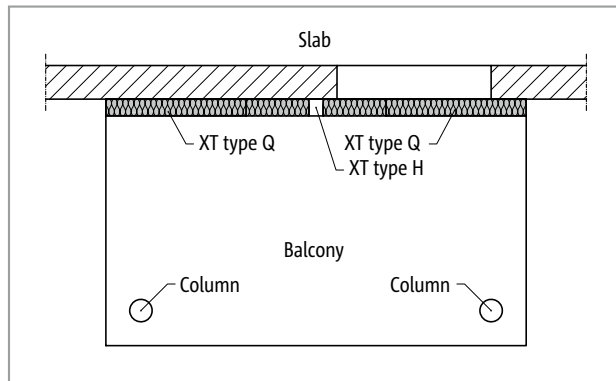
Schöck Isokorb® XT type H: Balcony with column support
